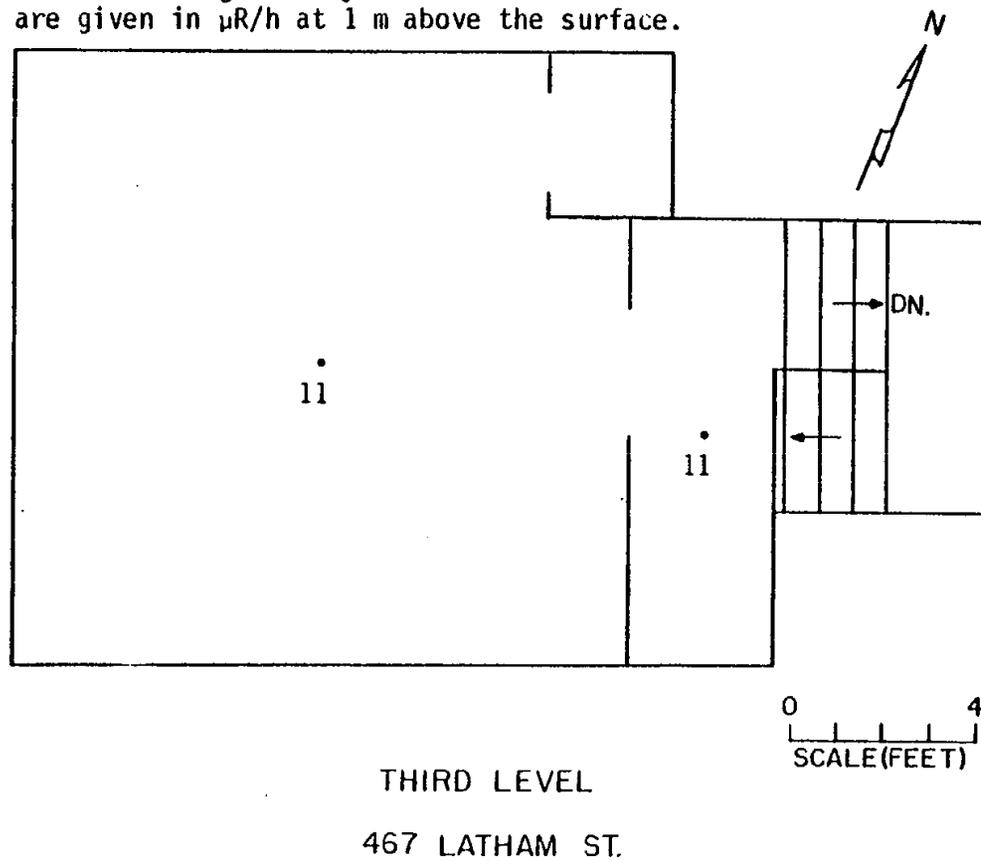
Schematic of the third level floor plan at 467 Latham Street showing external gamma-ray measurement results at 1 m.
